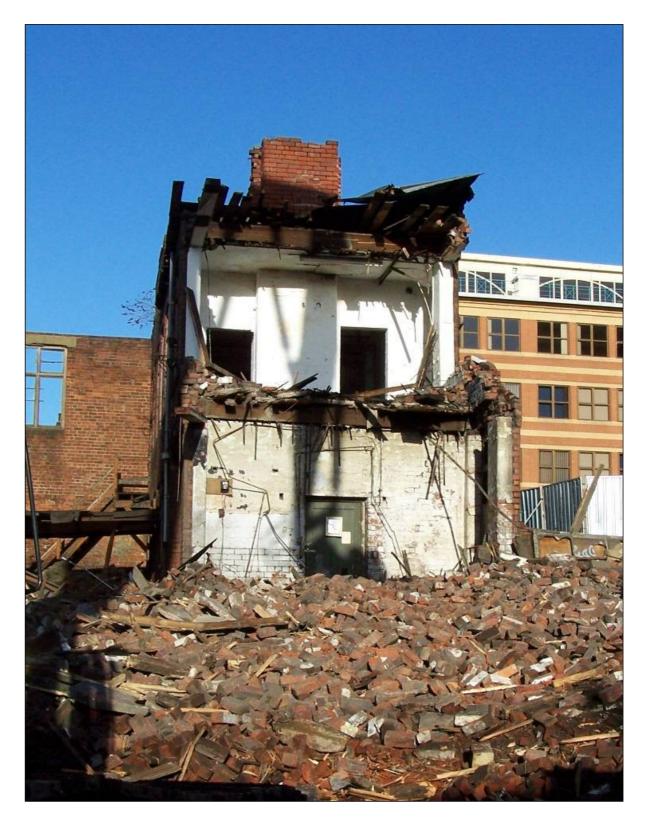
General view of east range during demolition showing floor and ceiling construction (film D.25)
